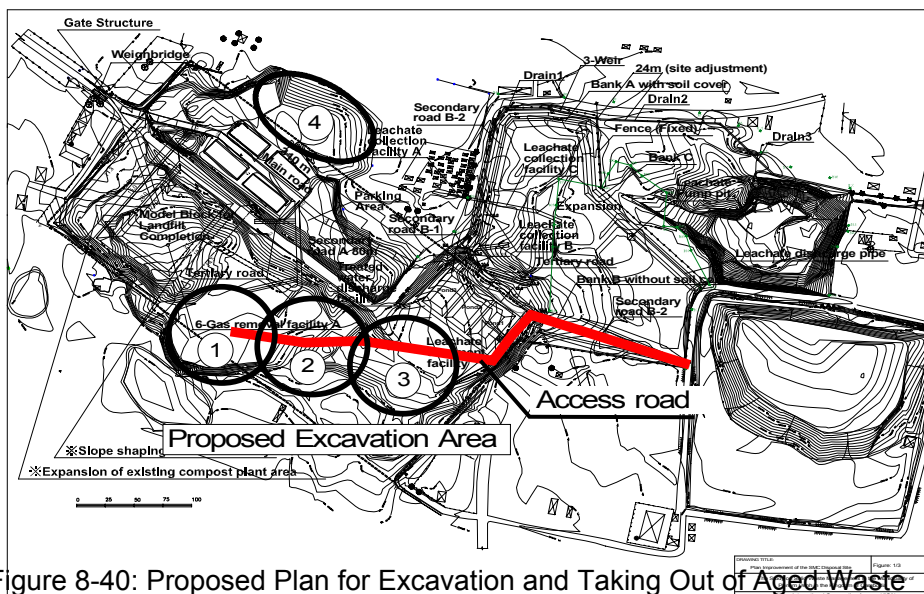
Proposed Plan for Excavation and Taking Out of Aged Waste
